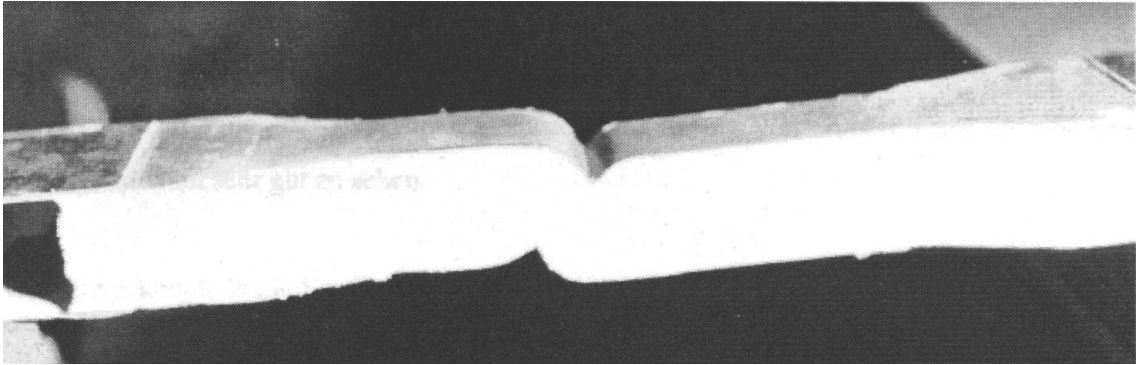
Sandwich beam after wrinkling failure [Stockinger, 1996]
